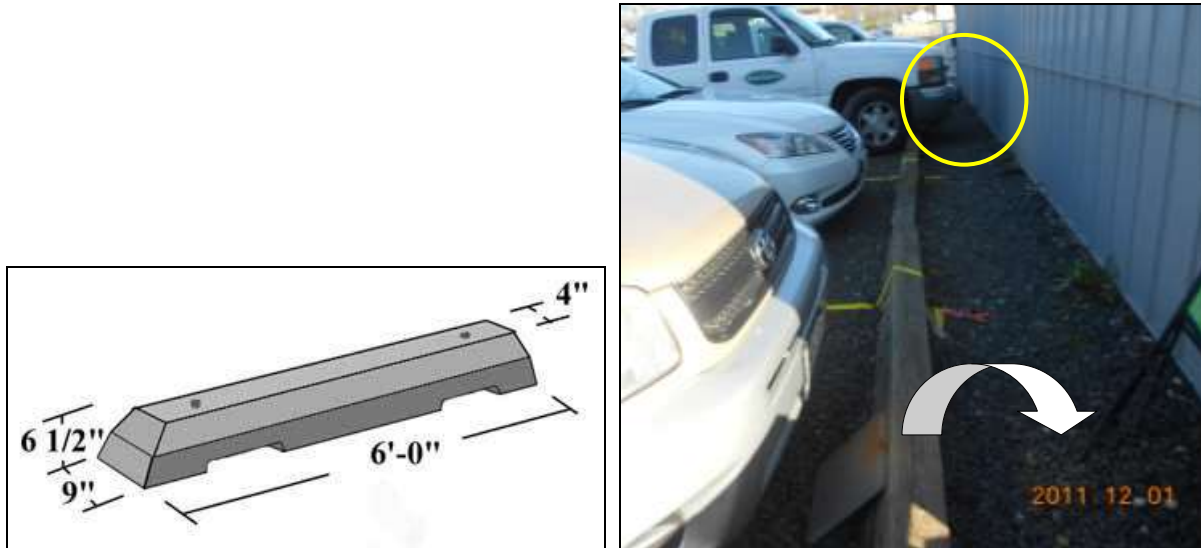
(A) Consider a precast parking chock to protect front of building. (B) Truck was very close to siding of building; wood wheel stops were leaning, failed and not performing as intended.
